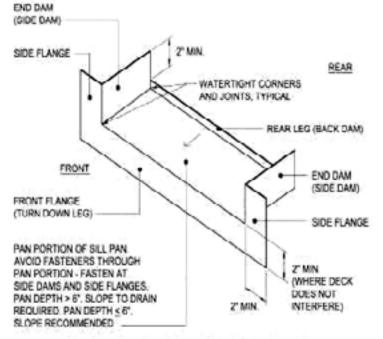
Configurations of Typical Sill Pan Flashing--isometric
